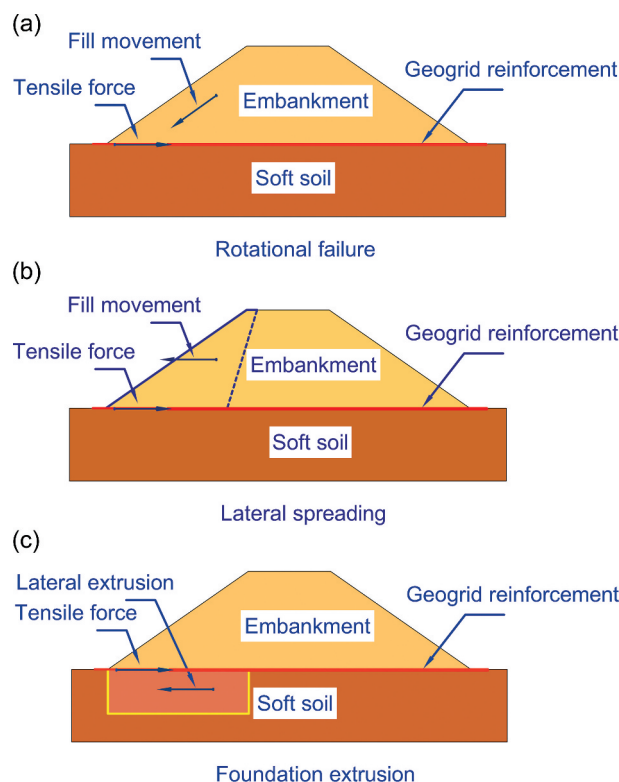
(a) Base reinforcement mechanism - rotational failure (adapted from 2020)). (b) Base reinforcement mechanism - lateral spreading (adapted from 2020)). (c) Base reinforcement mechanism - foundation extrusion (adapted from 2020)).
